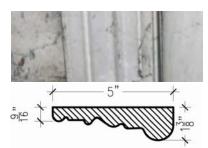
Door D001 casing molding type-1 photo and profile. (Photo: BBB, 2007)
